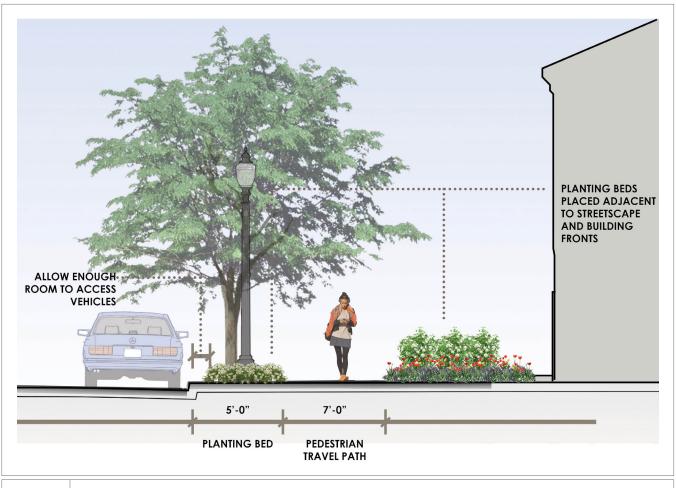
| WIDE SIDEWALK SUITABLE FOR NON-RETAIL AREAS
